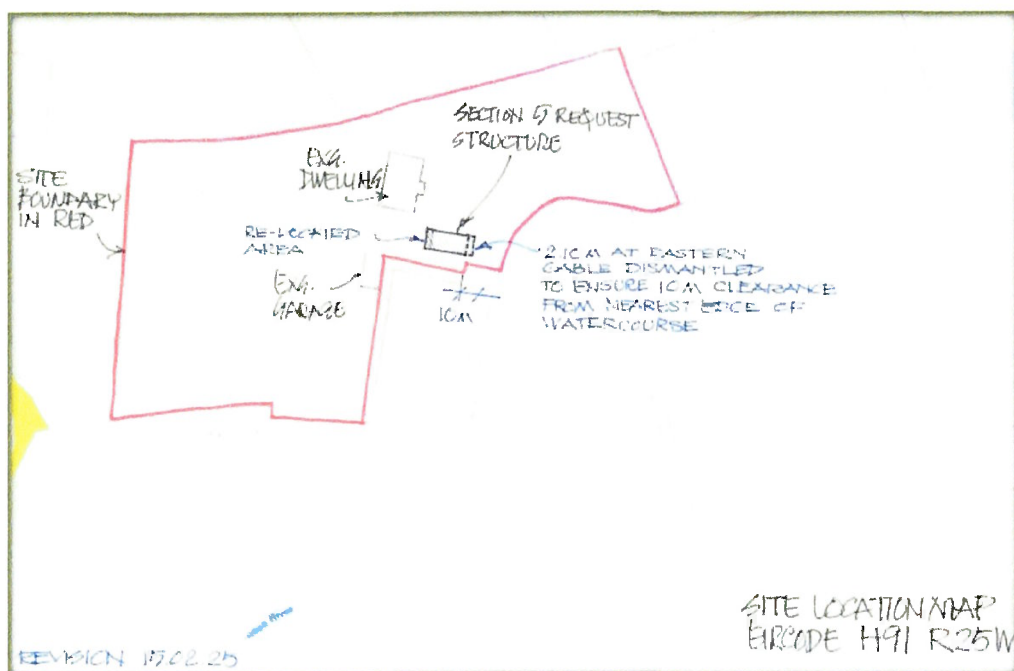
Site Plan showing Existing Dwelling and Section 5 Request Structure
